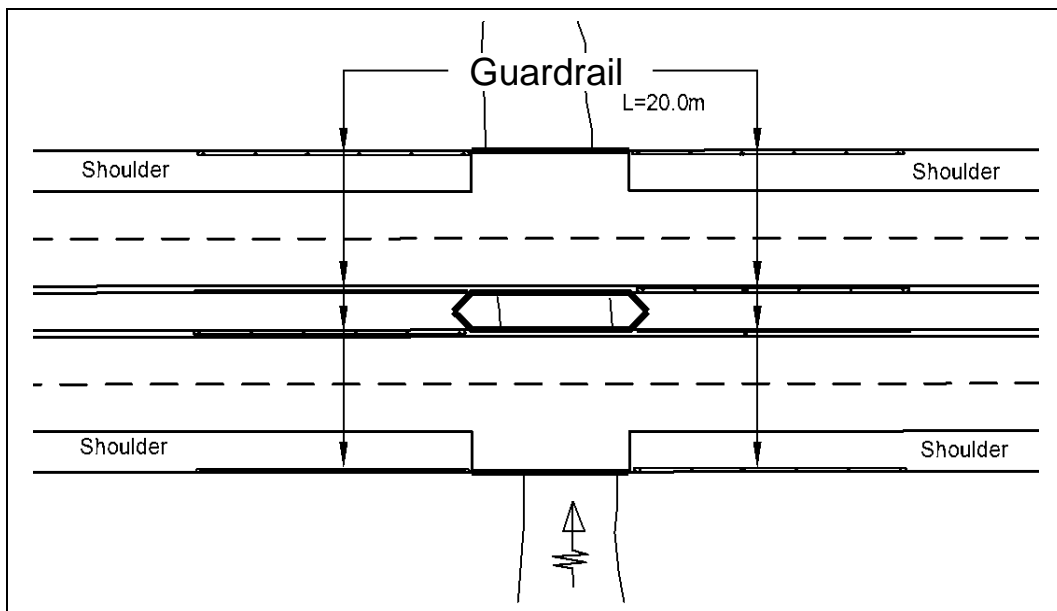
Plan of Guardrail at Approach of Bridge
